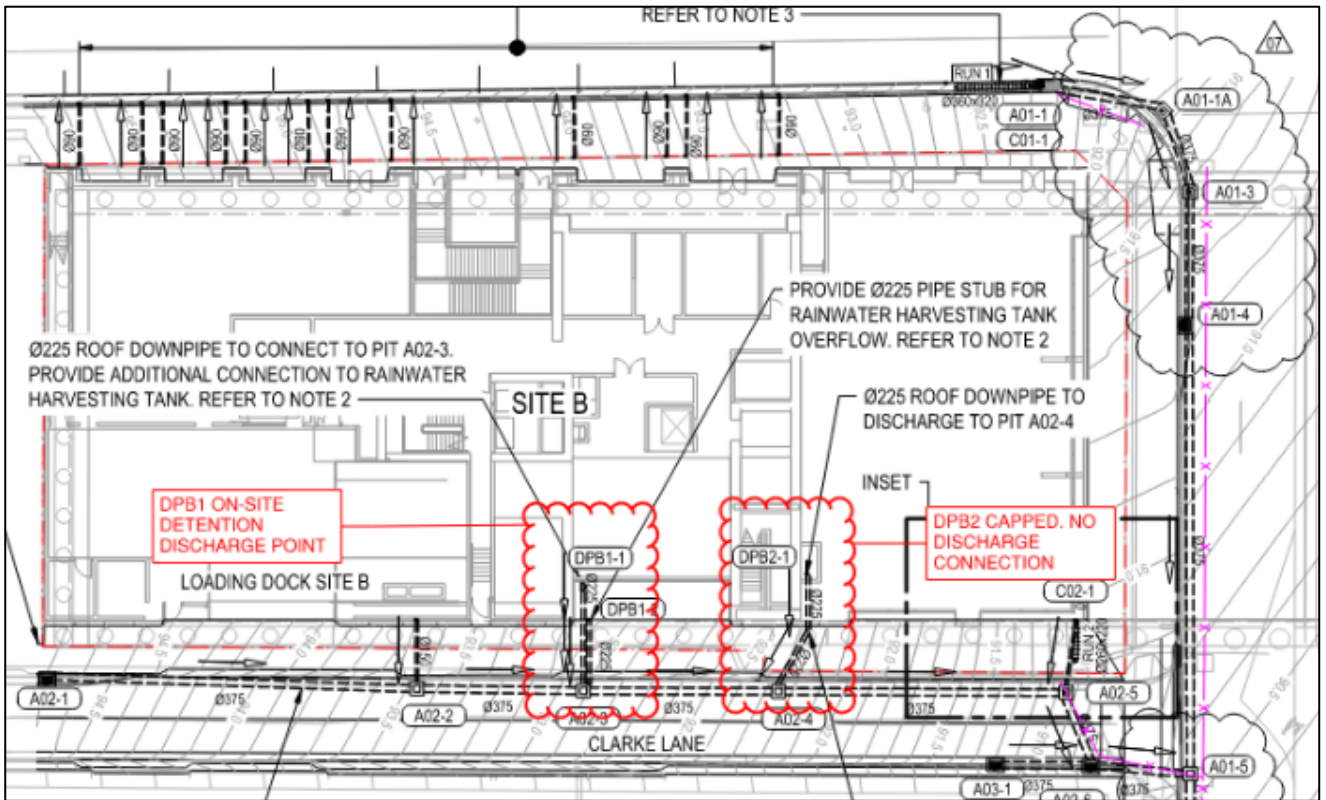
Existing Stormwater Infrastructure (Source: Sydney Metro Proposed Drainage plan Drawing SMCSWSCN-SMC-SCN-DD-DWG-207011 Rev 7, by CNDC, last revised 17 May 2023)
